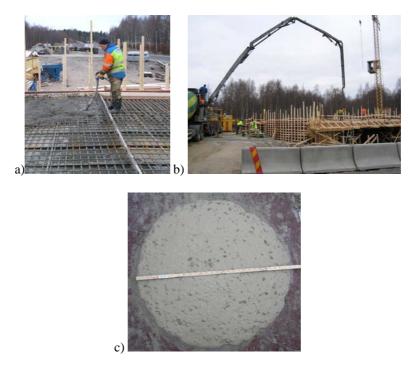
a) Worker using a vibrator for compacting normal concrete. b) SCC being pumped into formwork. c) Slumpflow test on SCC measuring approximately 740mm.
